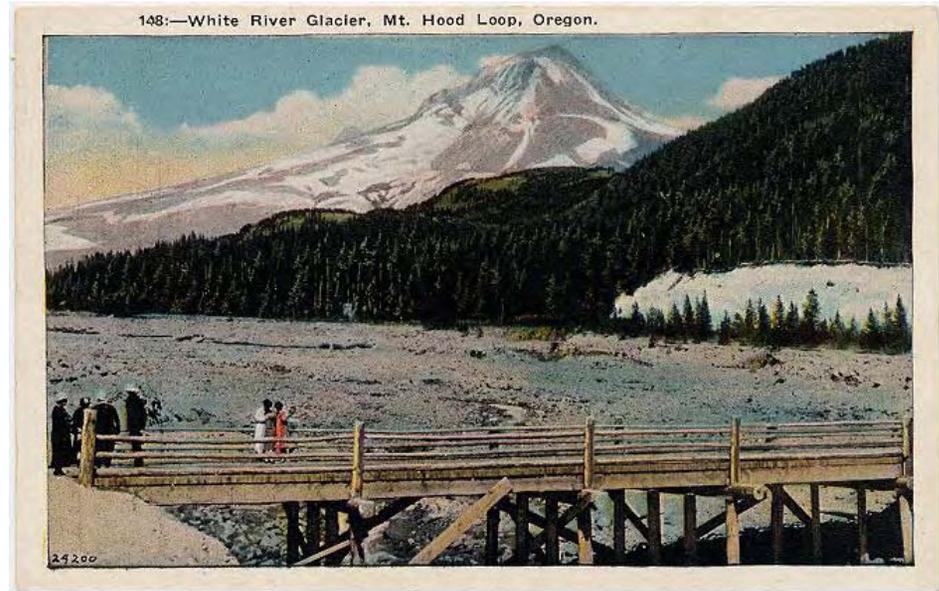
The first bridge at the existing White River crossing (1925 – 1954)
